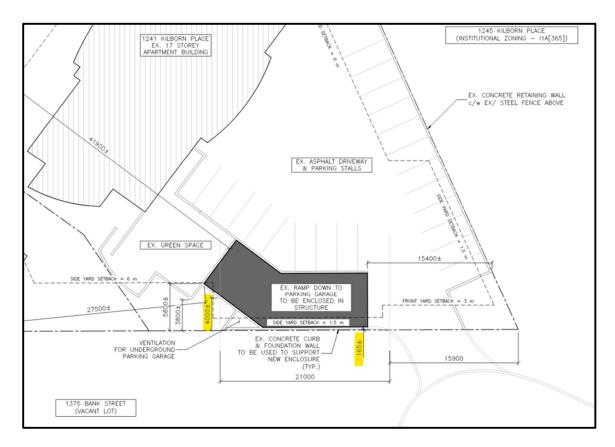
Proposed Ramp Enclosure Plan (Source: Art Engineering Inc.)
